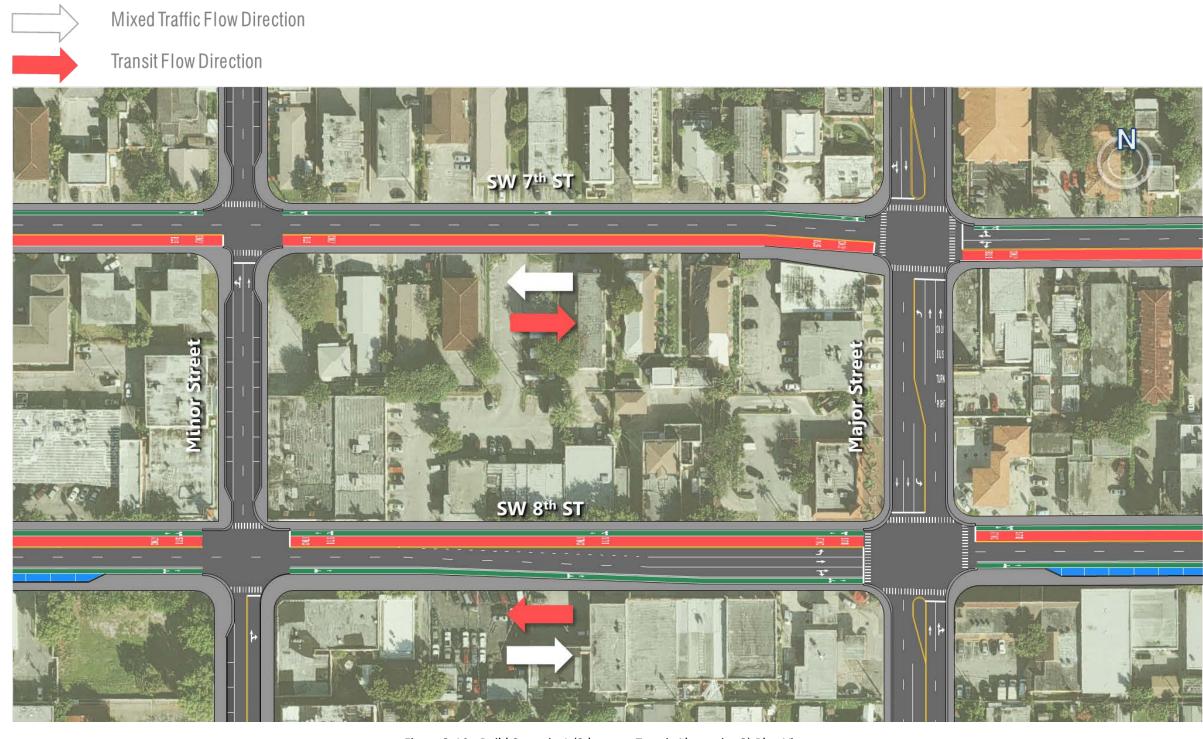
Build Scenario 1 (2 lanes + Transit Alternative 3) Plan View
